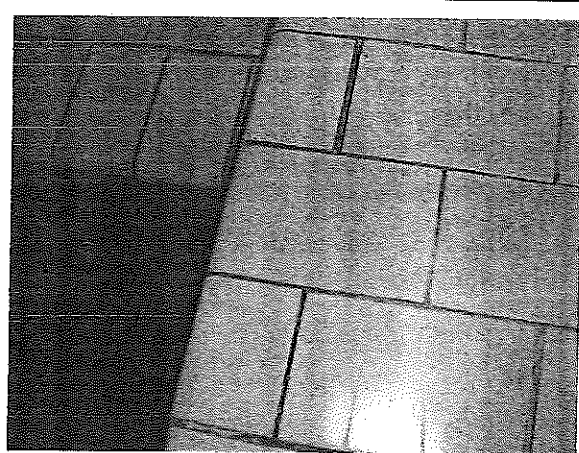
Viewing cream 4"x 6" ceramic wall tile, Basement – Kitchen.
